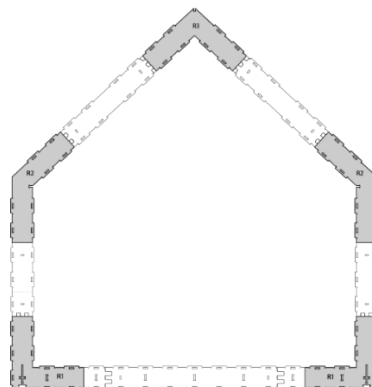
Structural reinforcers of the building frame (grey). (Source: Wikihouse Github Page)
